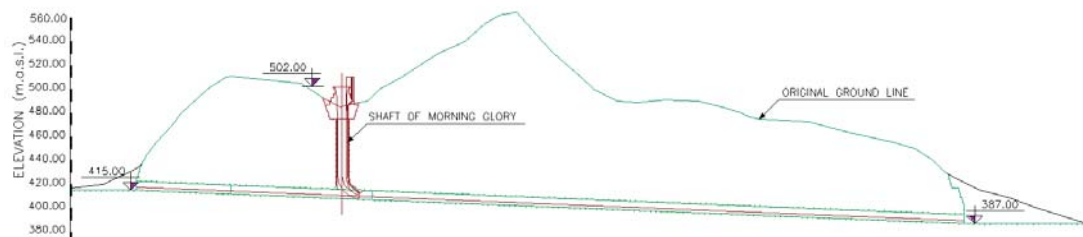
Longitudinal Profile of Spillway and Haraz Road Tunnel
